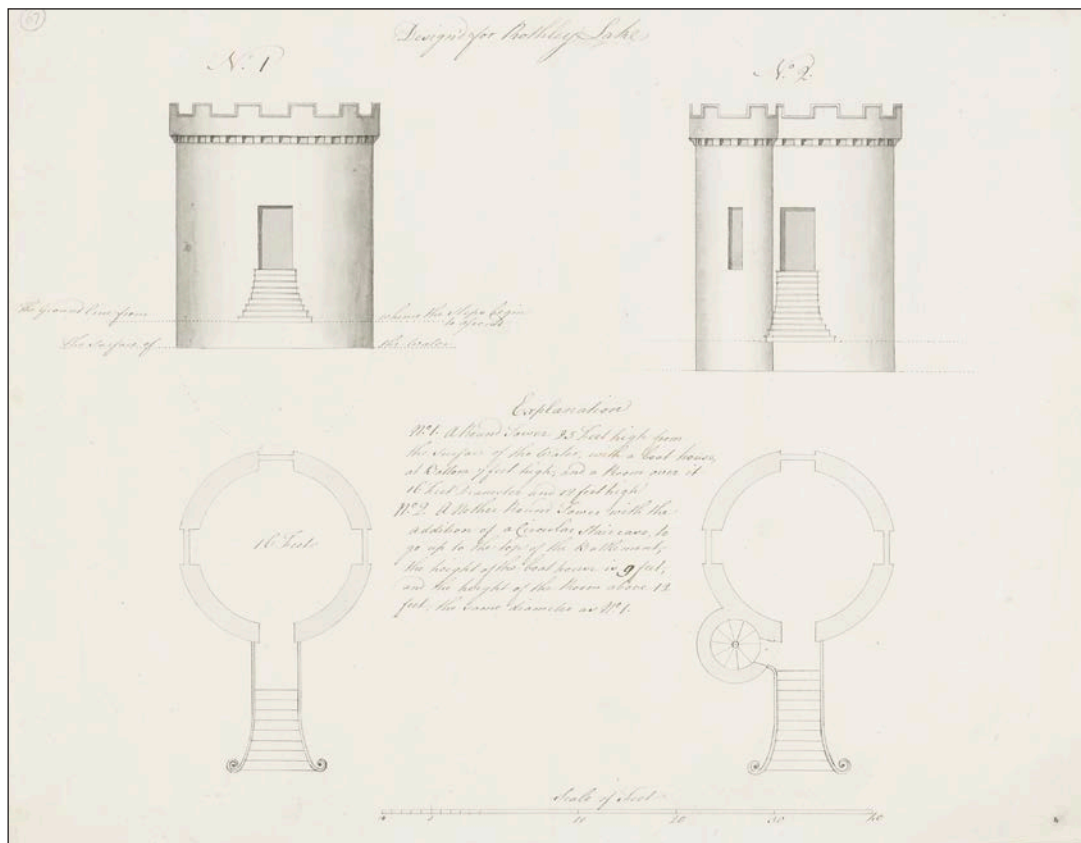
Round Tower, two alternative designs on one sheet, elevations with plans, to stand above Rothley Lower Lake, Northumberland, n.d. c.1760s. (National Trust Collections 582489)
